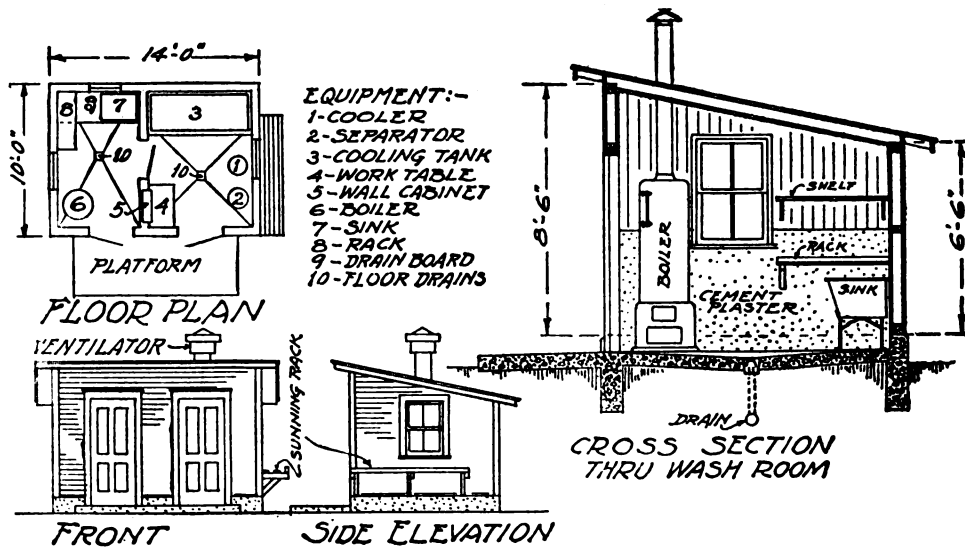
Plans of a two-room milchouse equipped with a boiler for washing and sterilizing.
